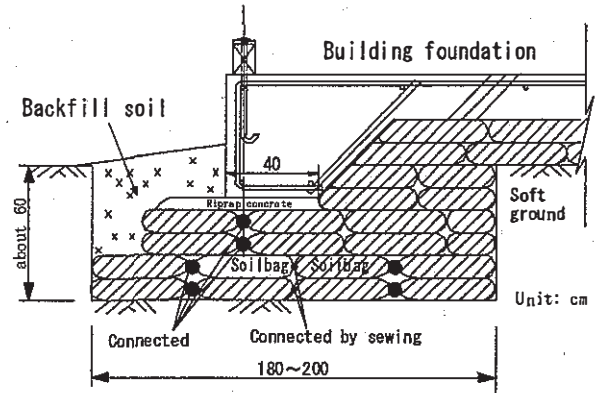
Typical arrangement of soilbags to reinforce soft foundation with N-values as low as 1~2.
